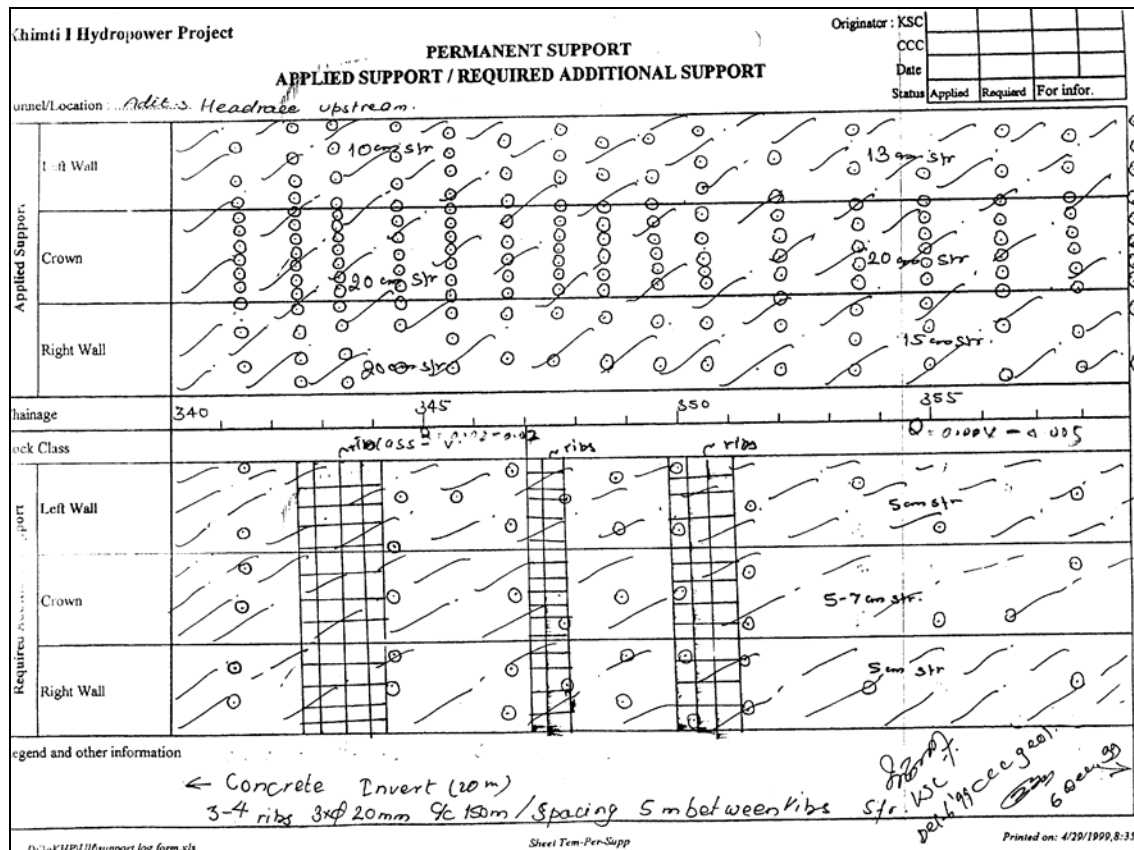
A typical 'Tunnel support registration' of Khimti headrace tunnel.
